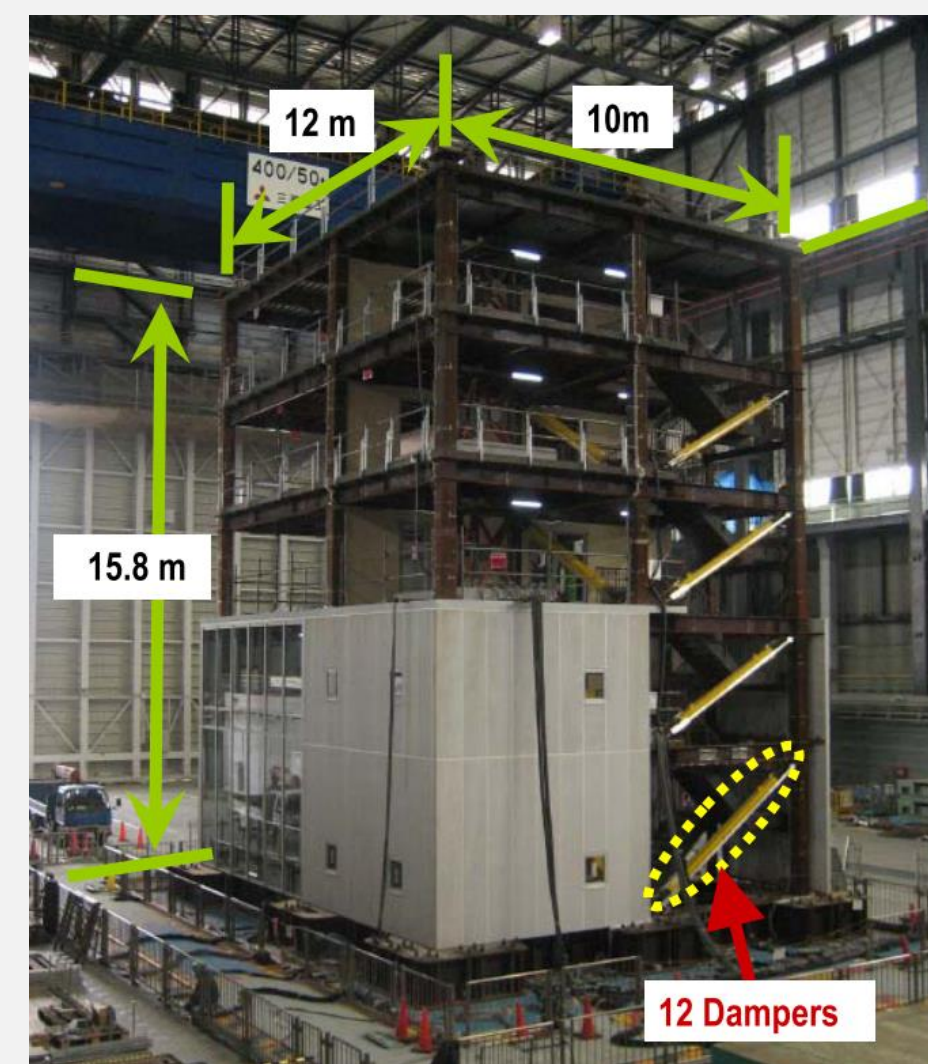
full-scale frame with viscous dampers erected on large shaking table, E-defence facility, Japan (Kasai et al. 2010)
